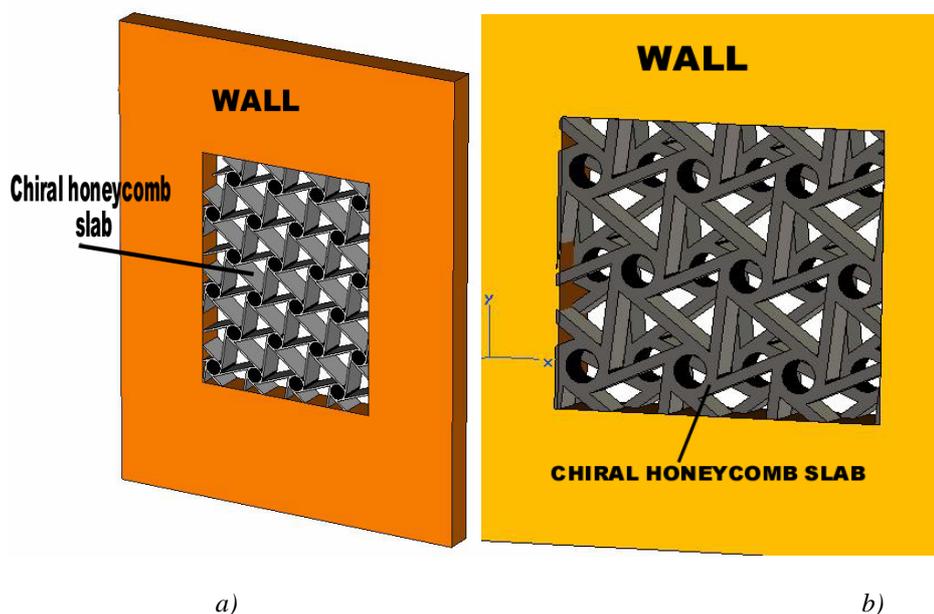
The proposed shield panels: a) single layer shield; b) double layer shield
